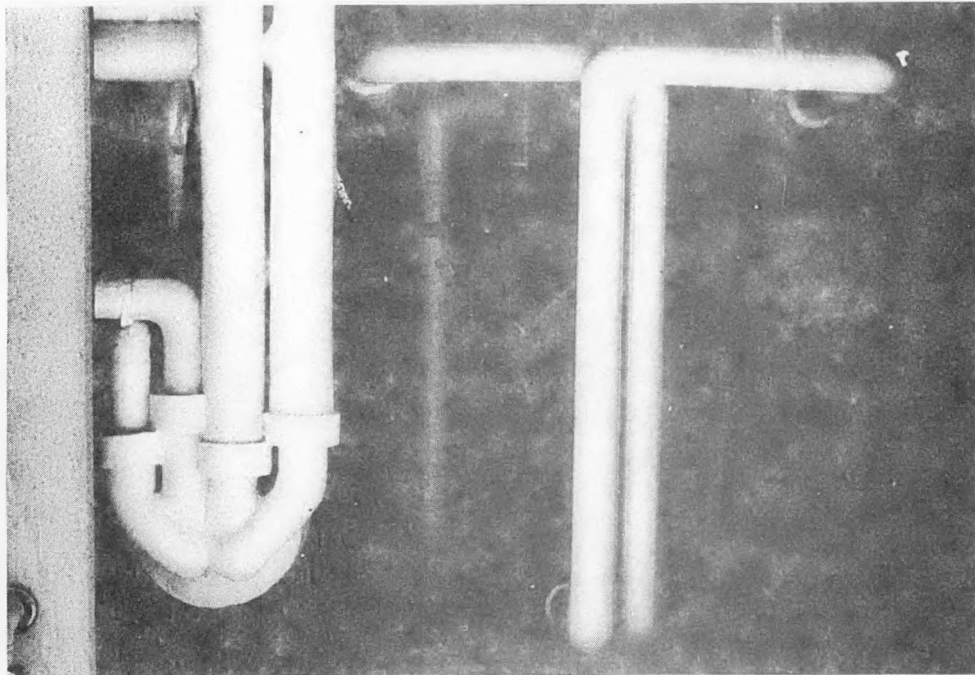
Component Insulation, Mechanical Equipment Room
